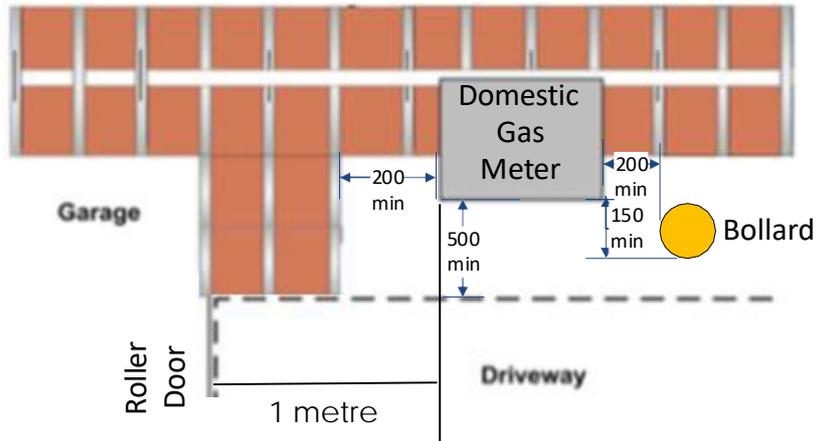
Plan View of Domestic Meter Installation near a Driveway
